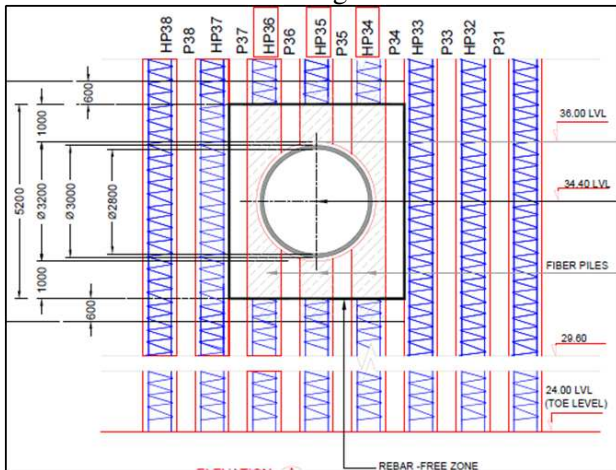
Secant pile wall adjustment for micro tunnelling entry
